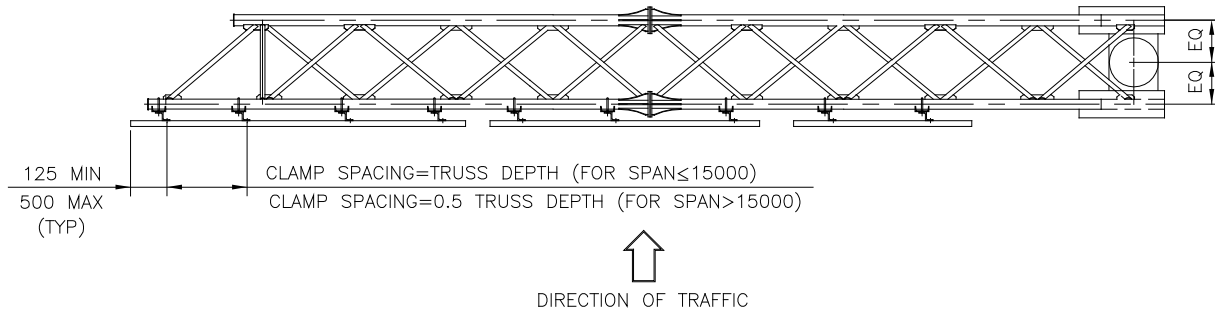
(a) TYPICAL LAYOUT PLAN
